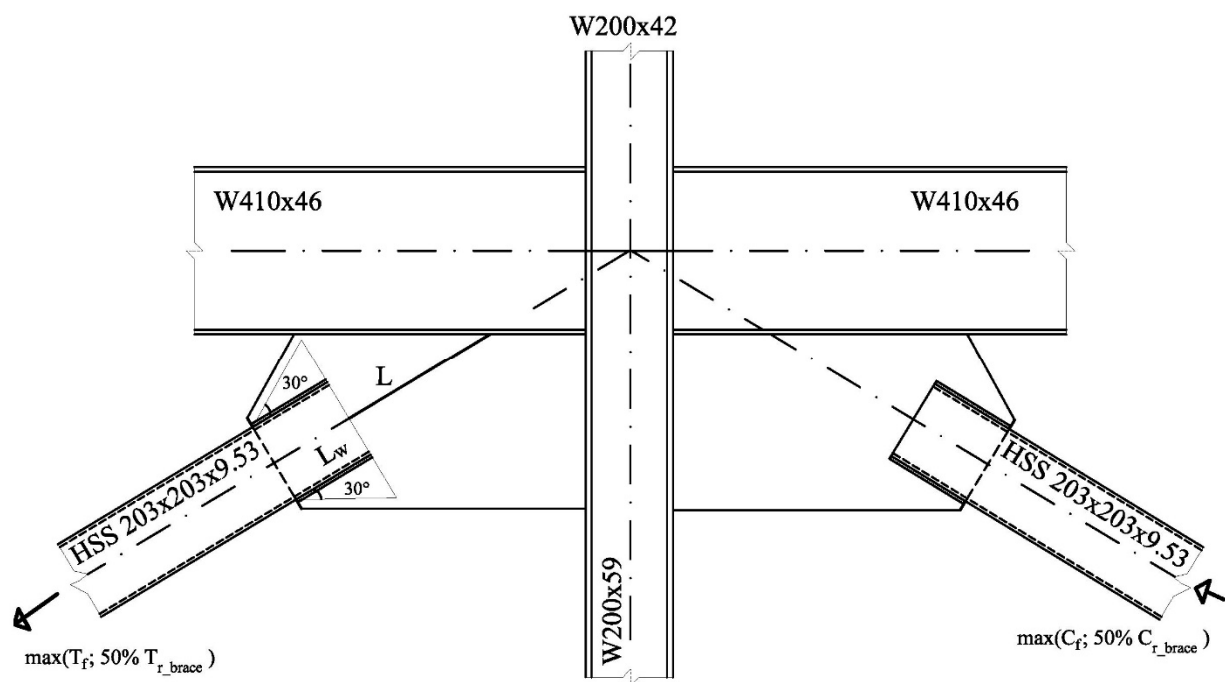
Middle connection detail at ground floor in N-S direction (pre-retrofit connection of 3-storey CBF, Quebec City)
